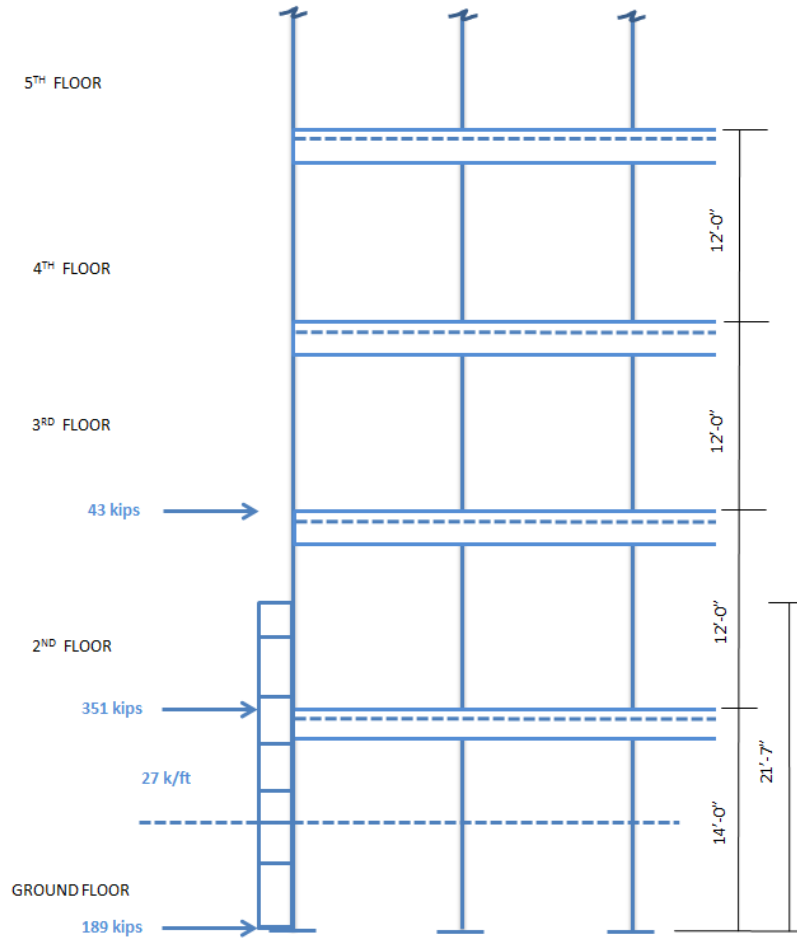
LC3 Tsunami loads on overall Monterey office building
